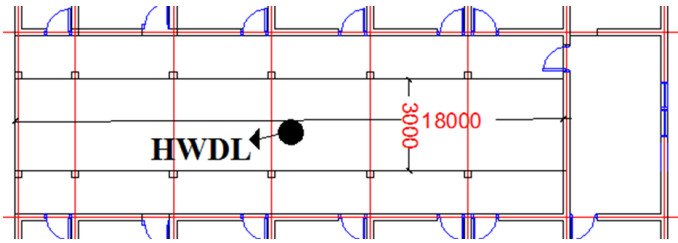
Floor Plan of the Semi-Enclosed Courtyard House
